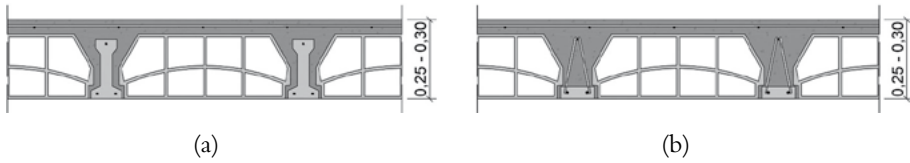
Sanitary one-way slab (a) and (b) typical section.
